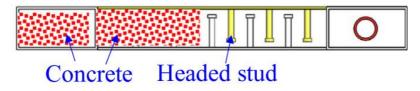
Details of overlapped headed studs (Yan et al. 2018).
